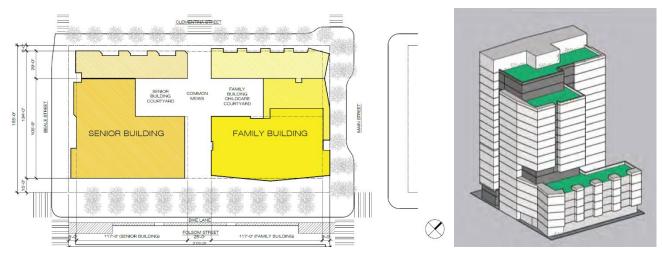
Proposed Site Plan (Left) and Axonometric View of the Revised Family Building Massing (Right)
